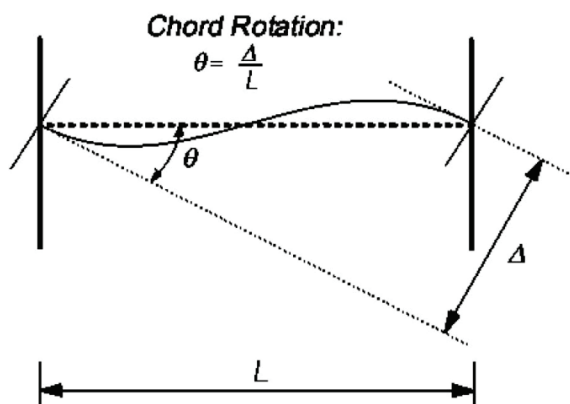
Chord rotation for structural wall coupling beams (Figure 10-6, ASCE, 2017). Printed with permission from ASCE.
